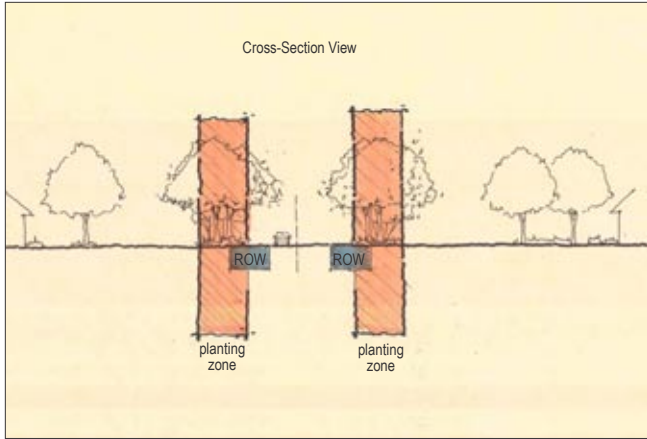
Minimum planting zone diagram. This is the planting area that is good for creating a tree canopy and scenic streetscape. Plantings in this zone also create a buffer between the building and the street.
